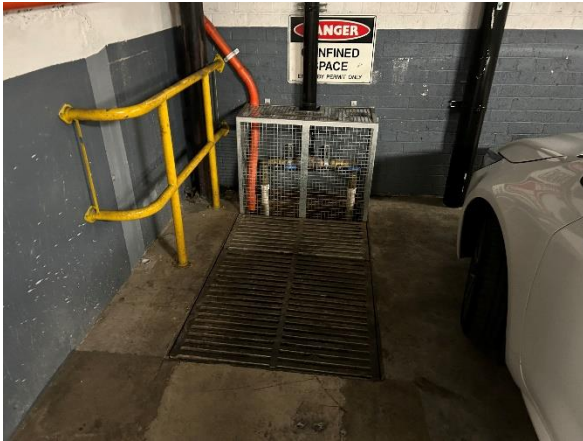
Level B2, Fan Room, unknown underground pit.
